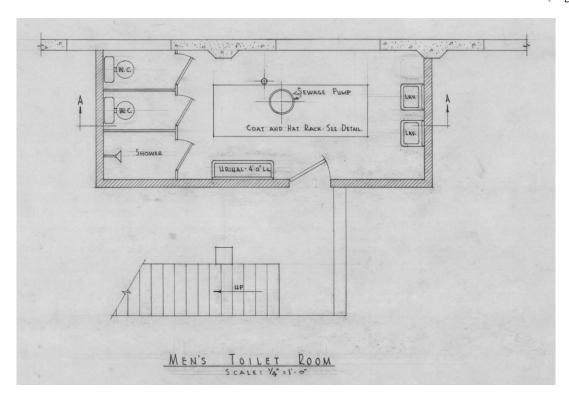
Detail of *Revised Floor Plan; Entertainment Floor of Pumping Station* (AES, Drawing No. 5368; 6 February 1951; See also retraces plan AES, Drawing No. 5350, as redrawn 27 June 1952; and *Plan and Detail of Men's Toilet, Entertainment Floor of Pumping Station*, AES, Drawing No. 53-65, 31 January 1951). This represents the final configuration of the bathroom facilities on the Entertainment Level. Reconfigured doors at head of stairs (removed three existing doors, added three new doors).
